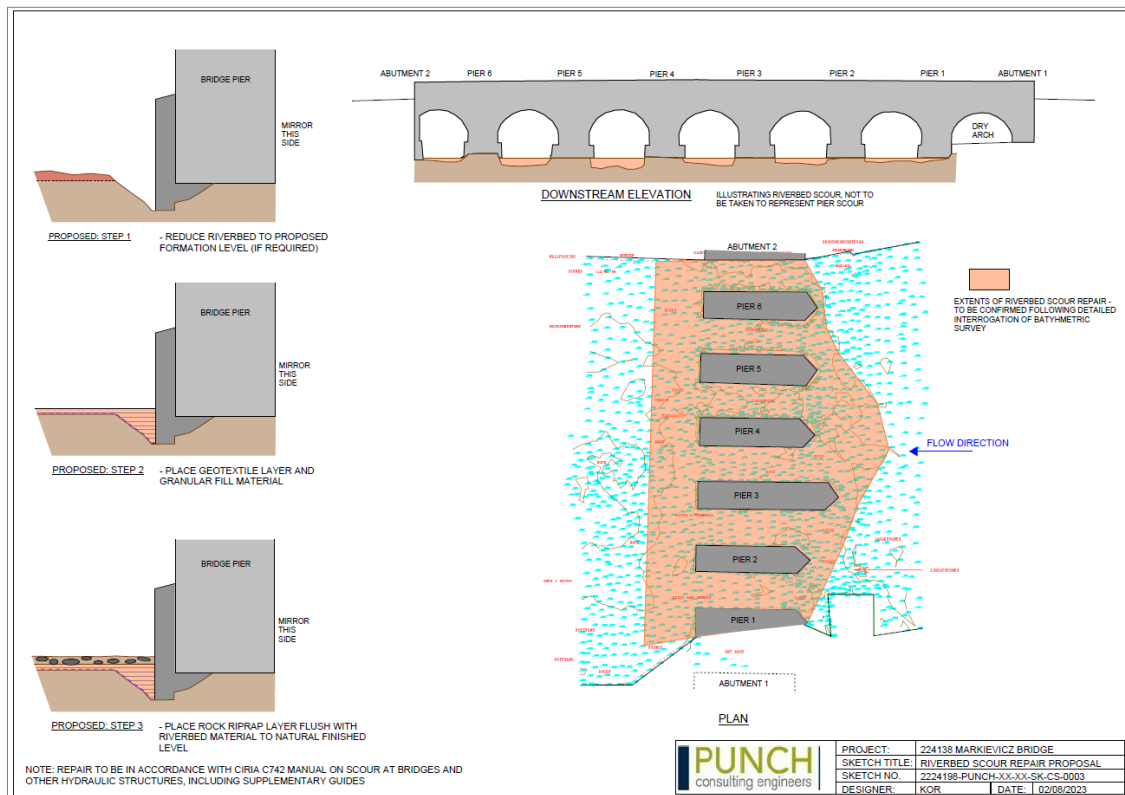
Scope of proposed scour repair work to riverbed (Punch Consulting Engineers).
